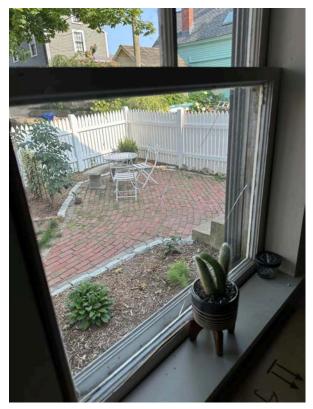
CRACKED WINDOW PANE REAR ELEVATION, CENTER
